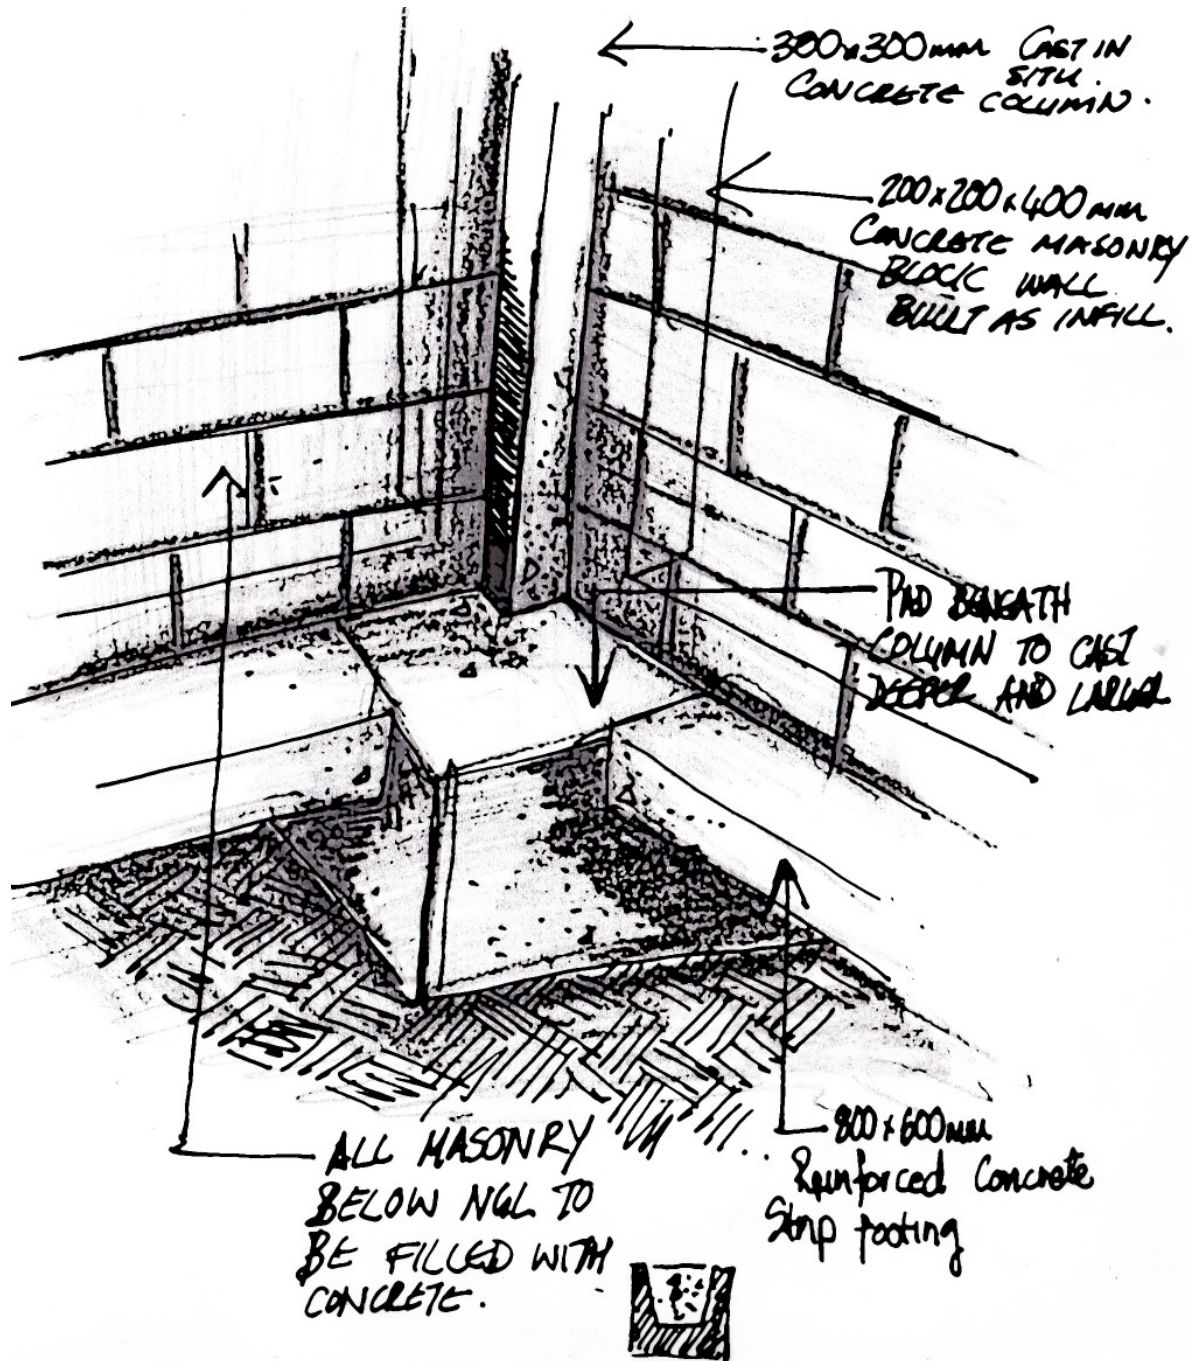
3-Dimensional sketch to show thickness of foundation beneath columns
